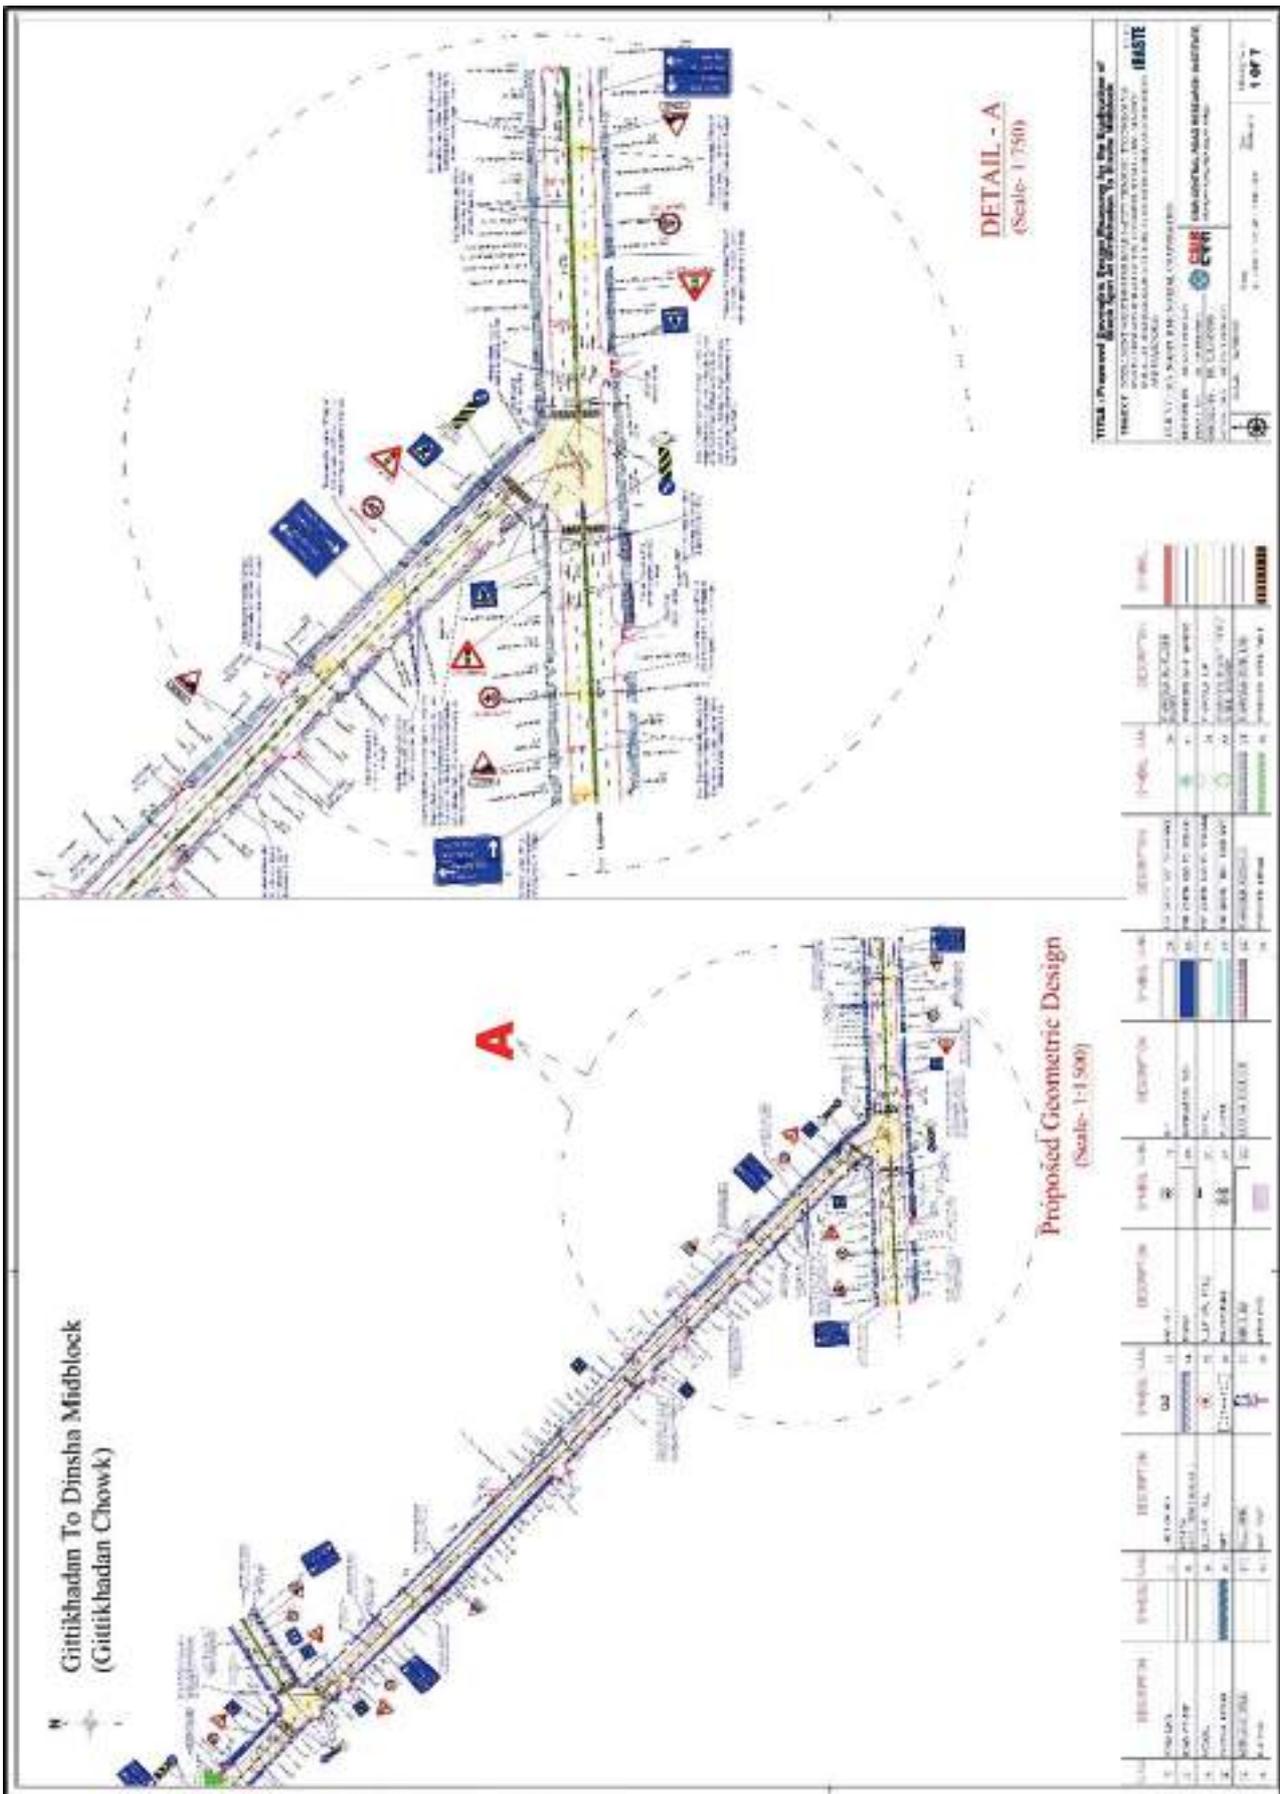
Detailed GDP for the Gittikhadan to Dinshaw Factory Road Stretch: View - 1
